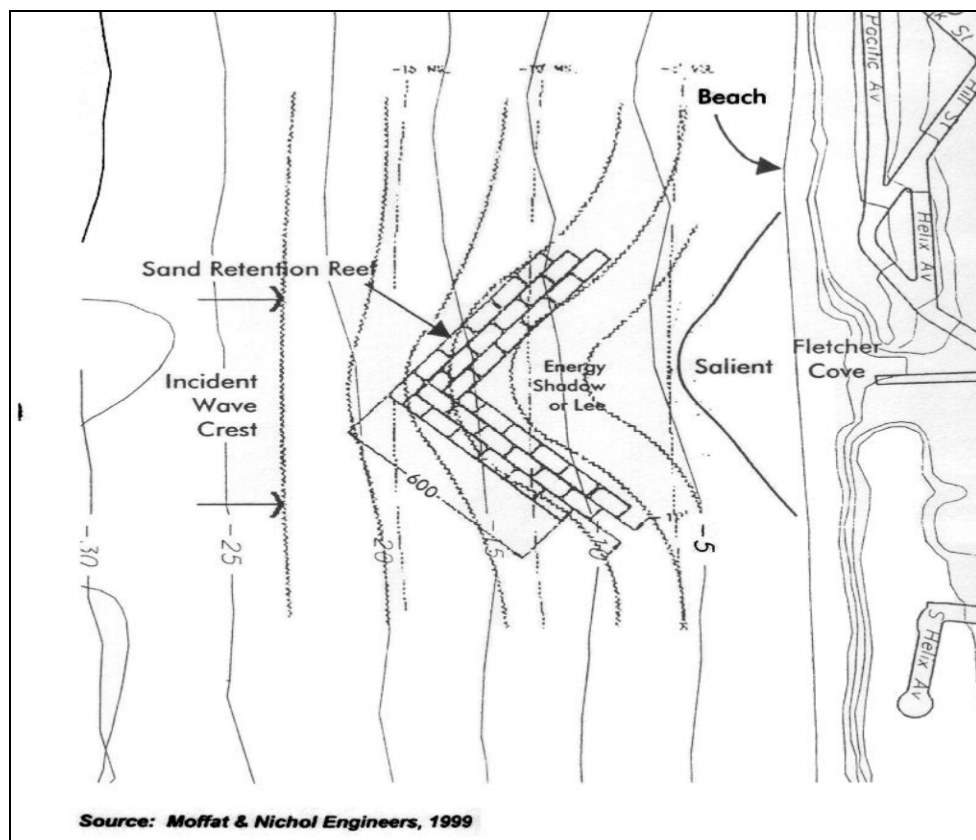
Typical Detached Breakwater (Plan View)
